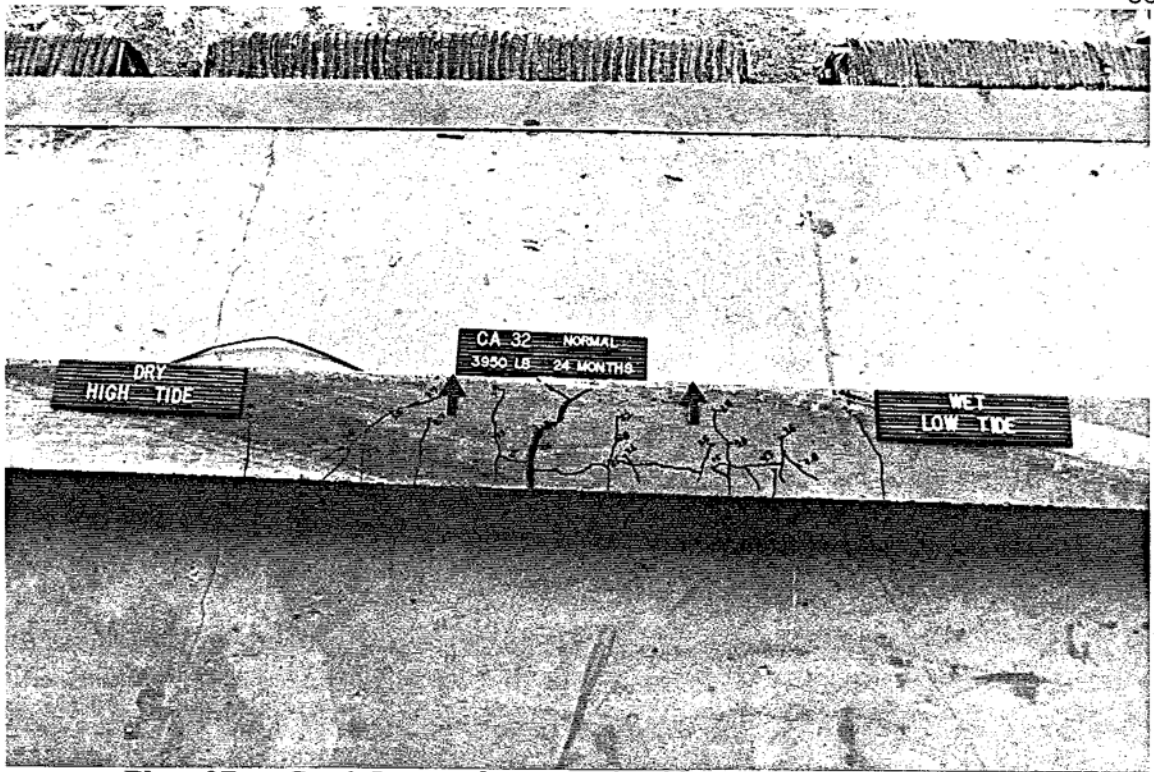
Crack Pattern for Beam CA 32 - Tested After 24 Months
